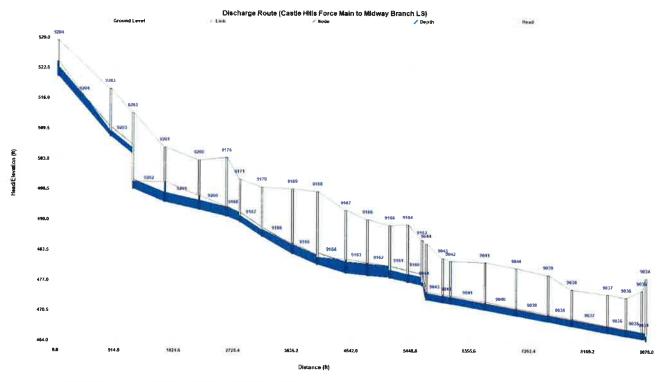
CASTLE HILLS LIFT STATION OUTFALL SEWER (Projected Buildout Flows)
